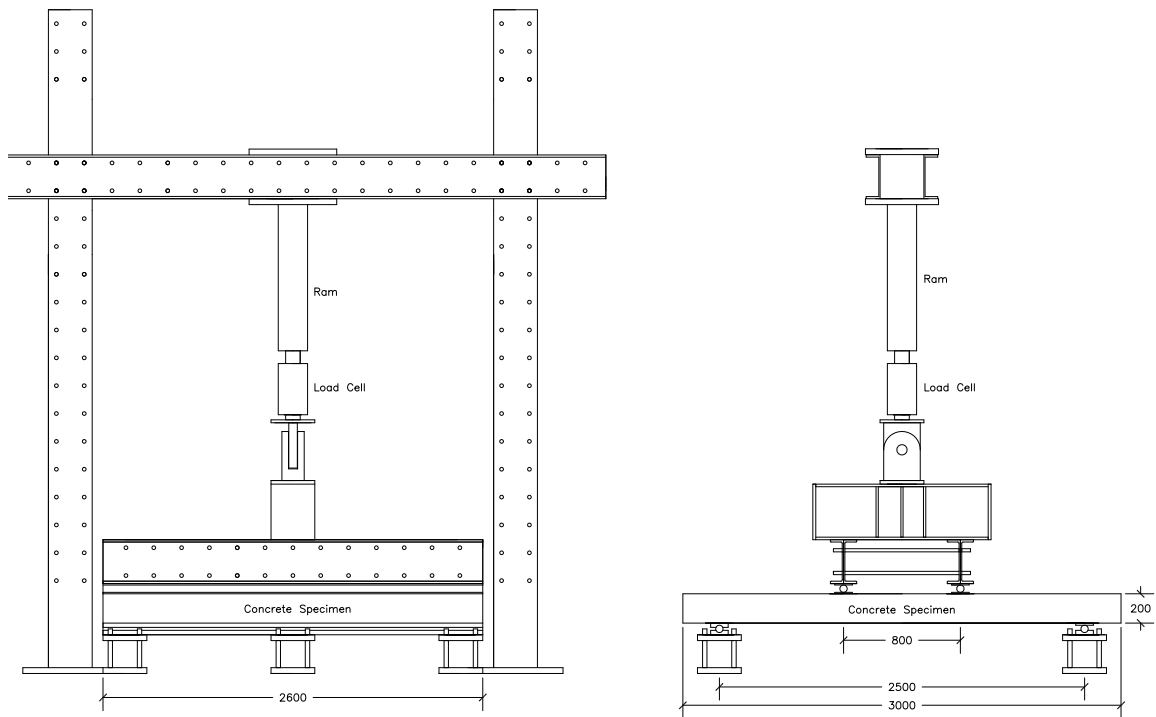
Drawing of test set-up. Left: Load frame and supports for flexural test. Right: Four 'point' bending set up (outer frame excluded). All dimensions are in mm.
